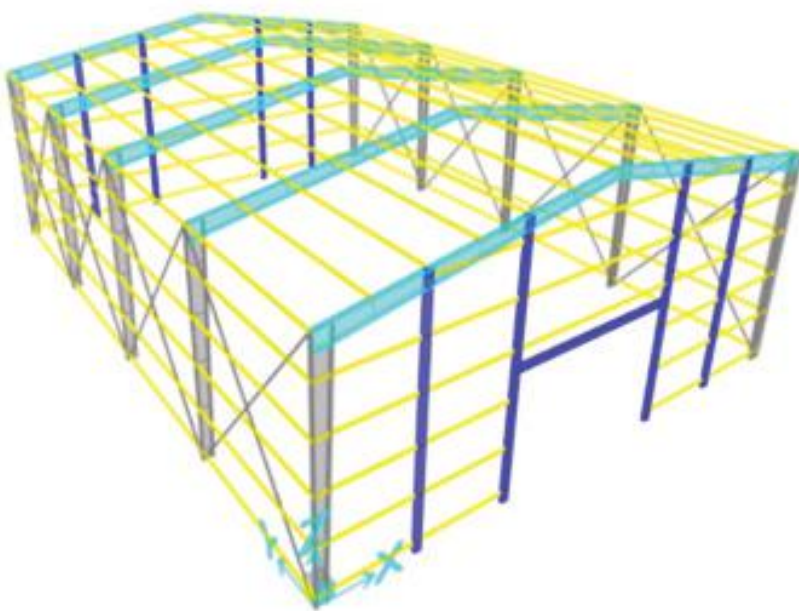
Three-dimensional structural framing model showing primary frames, secondary members, and lateral bracing system for the proposed storage facility.
